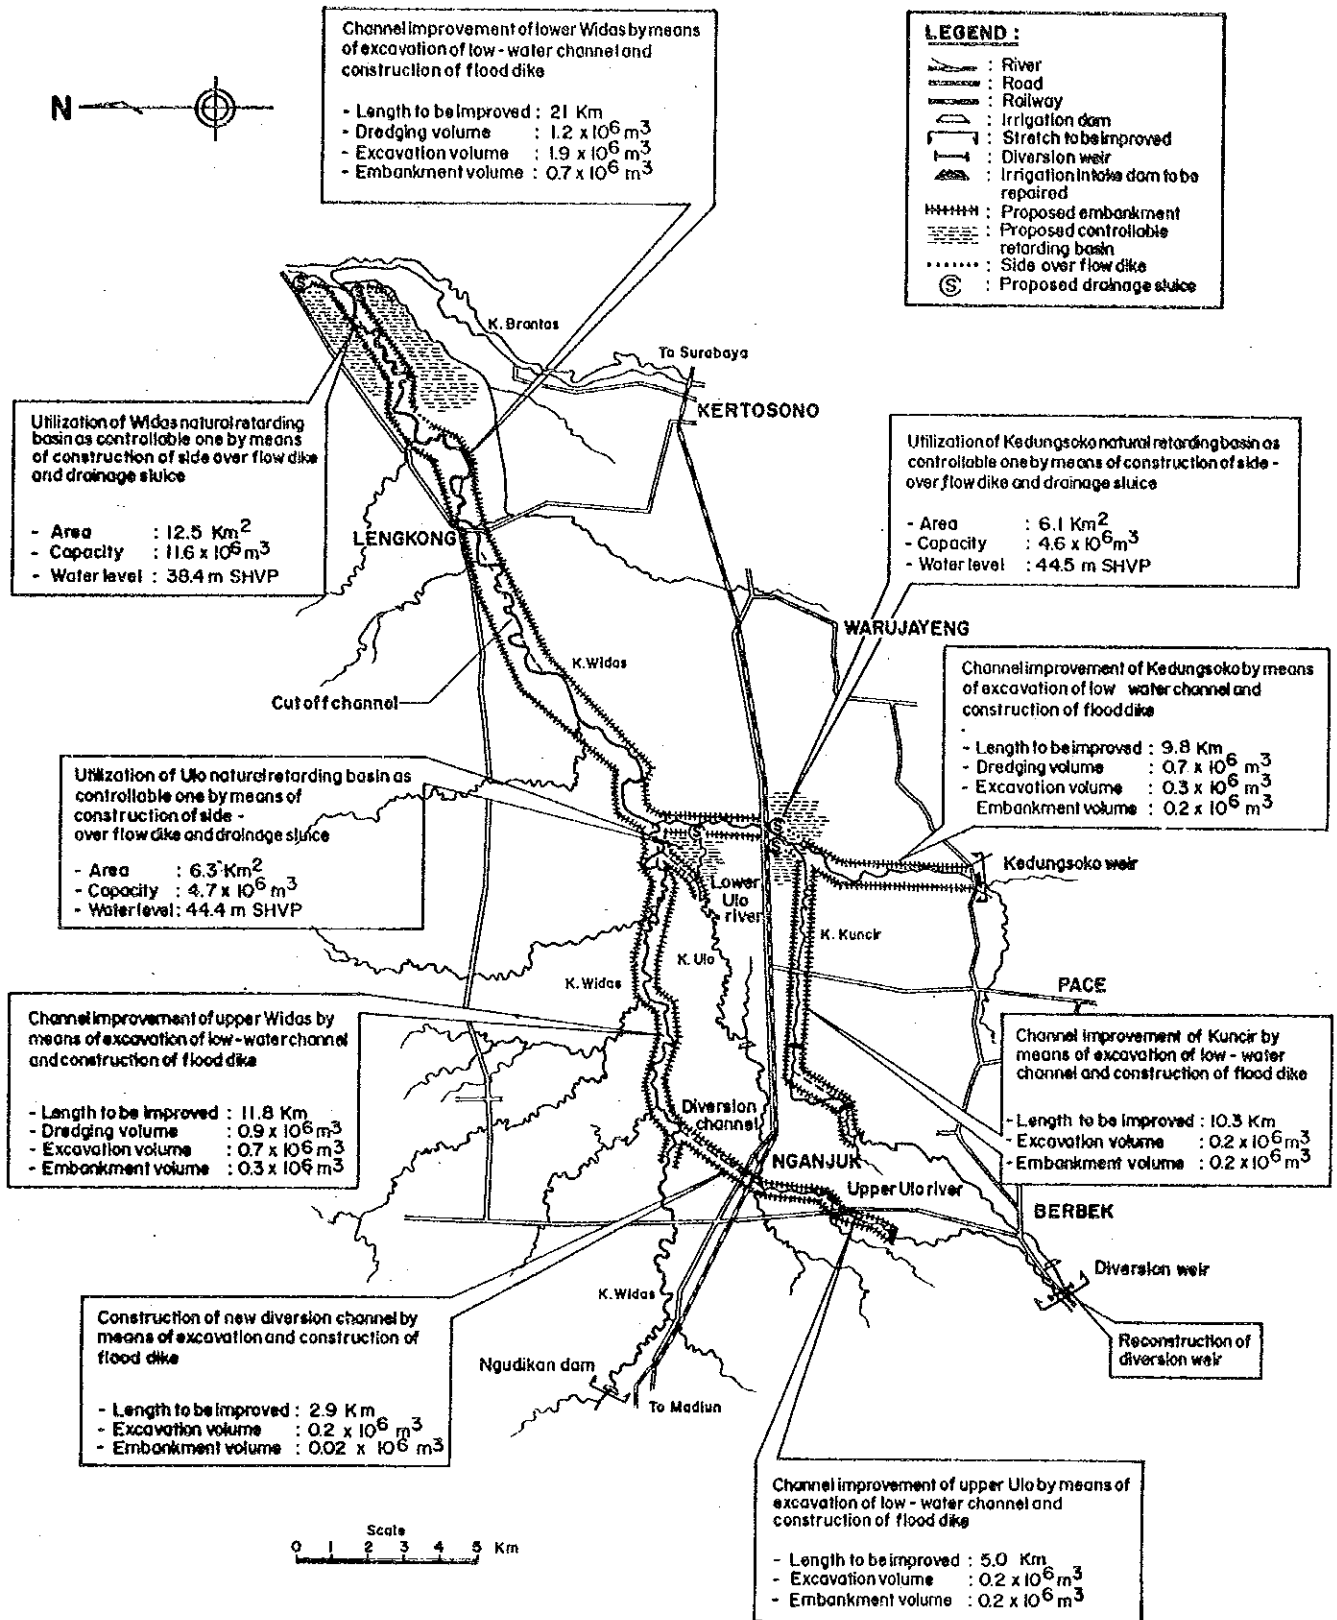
OUTLINE OF FIRST STAGE PLAN
